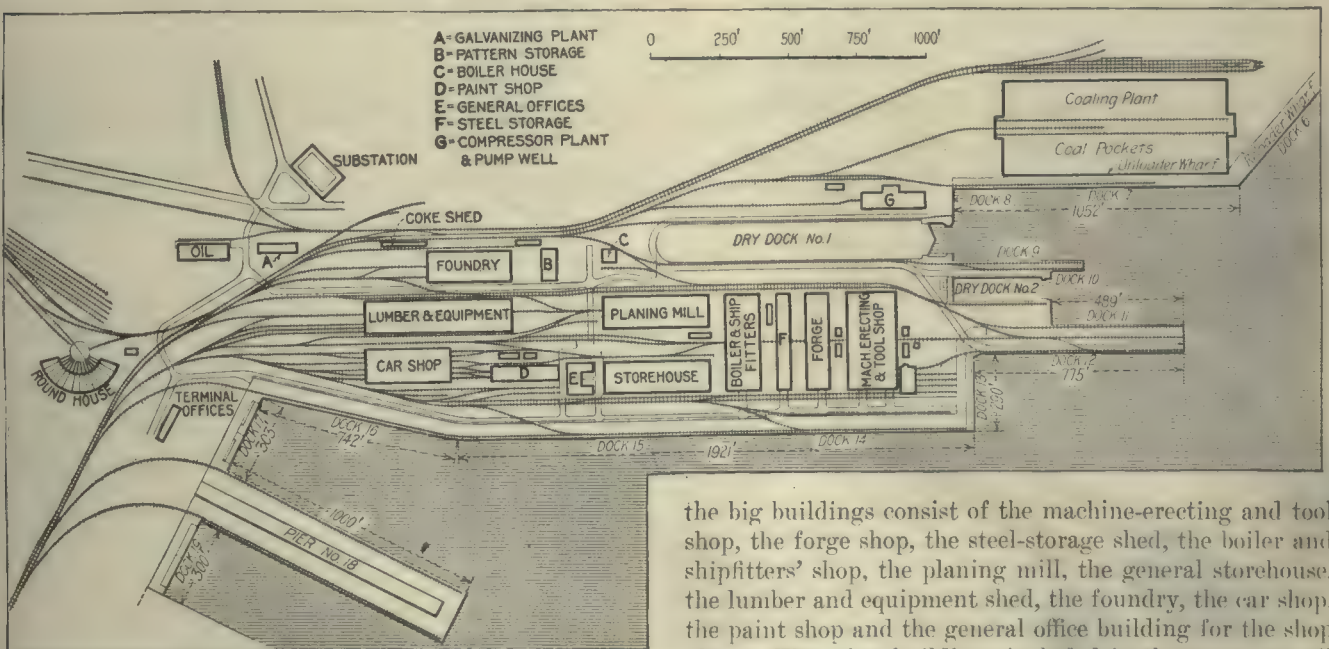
GENERAL ARRANGEMENT OF SHOPS, BUILDINGS, DOCKS AND YARDS
